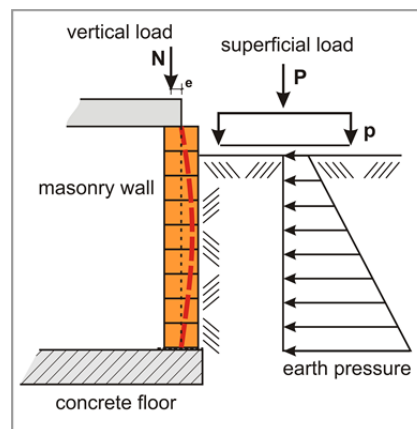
Out-of-plane Loaded Clay Masonry Basement Wall under Vertical Load
